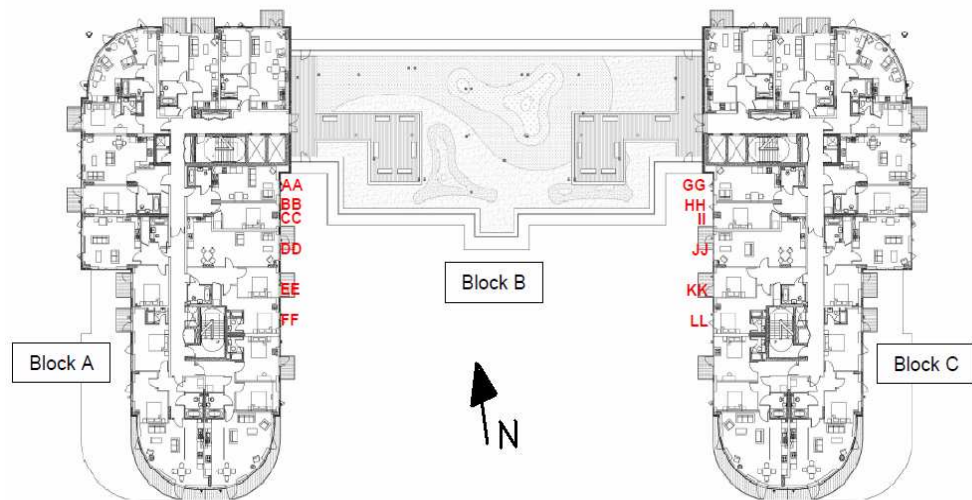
Plan of existing 14th floor, based on plan provided by BUJ Architects. This layout is replicated on the 15th floor. The blocks and the window positions analysed have been labelled.
